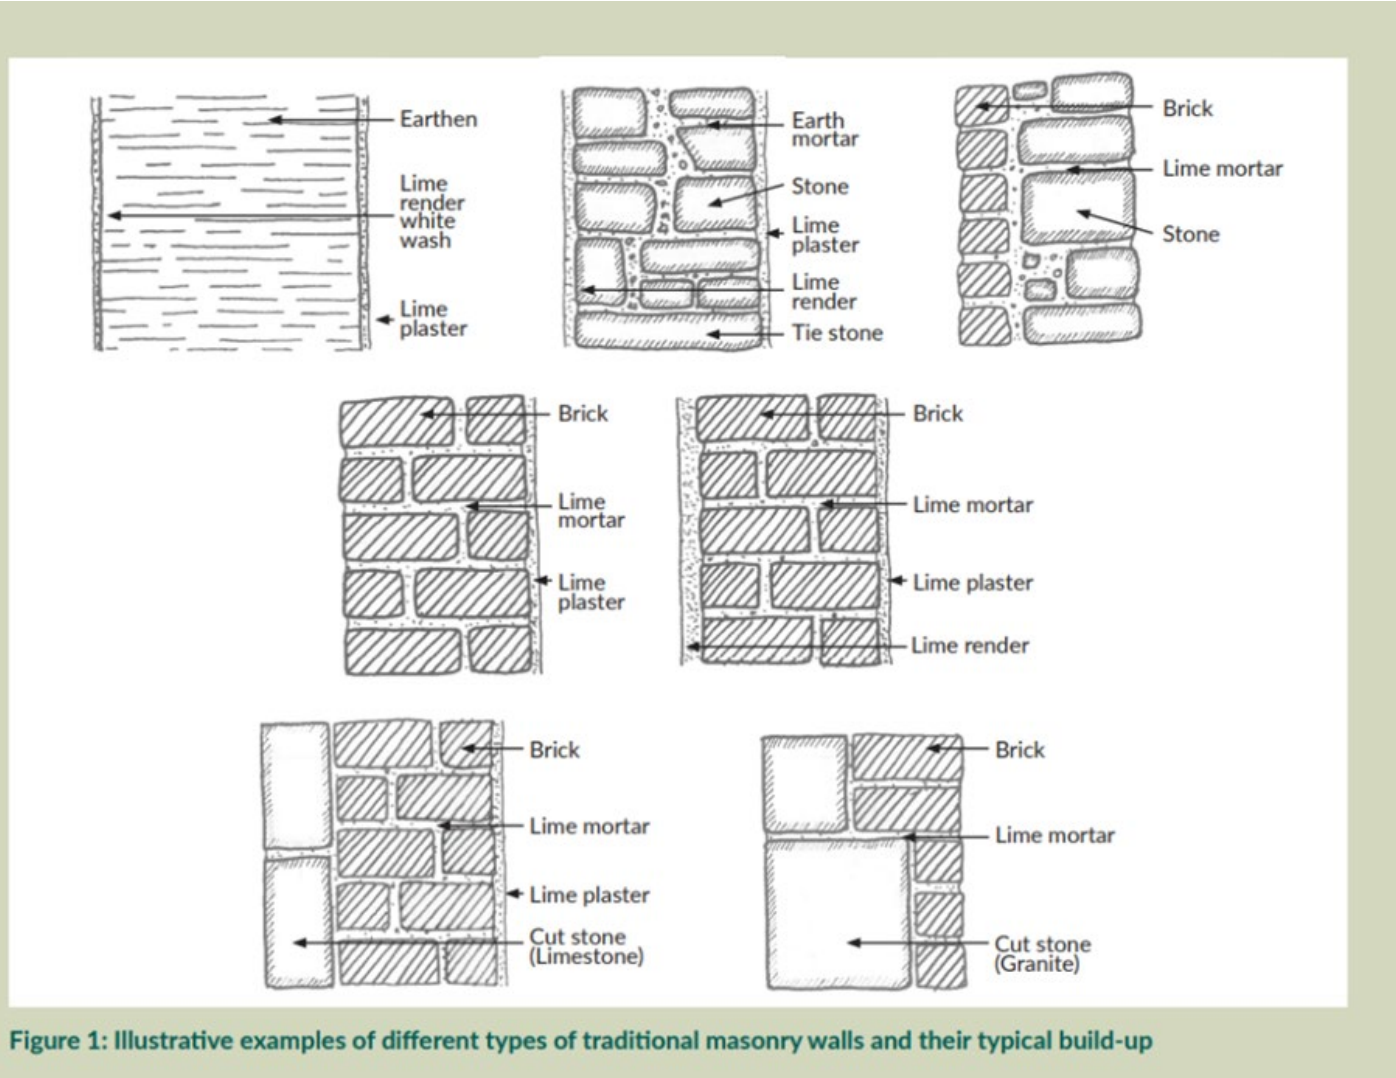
Illustrative examples of different types of traditional masonry walls and their typical build-up
